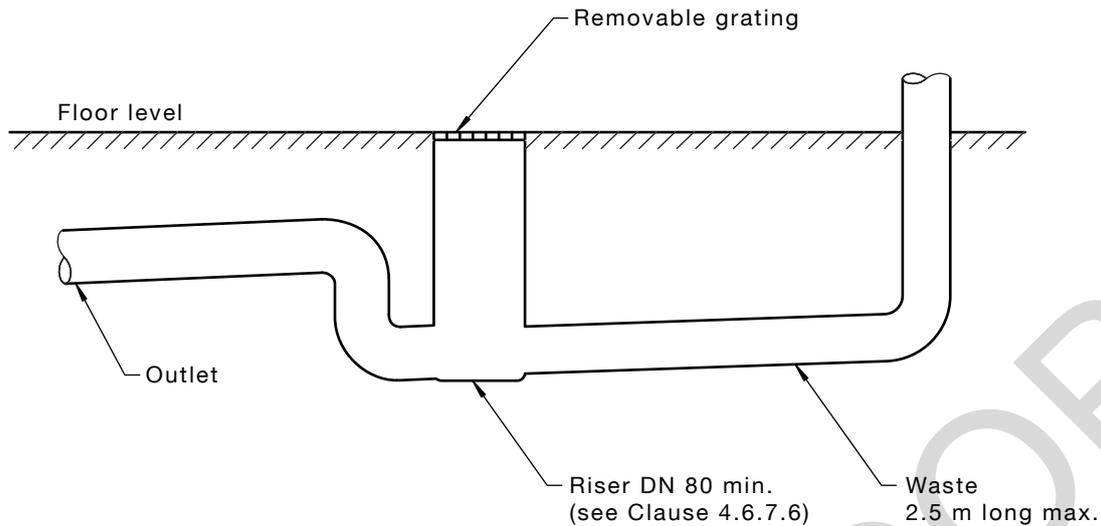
4.6.7.3 SUBMERGED ENTRY FLOOR WASTE GULLY
